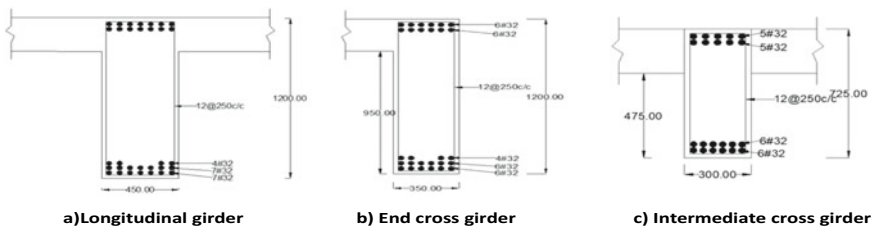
Girders, their dimensions (mm) and reinforcement details
